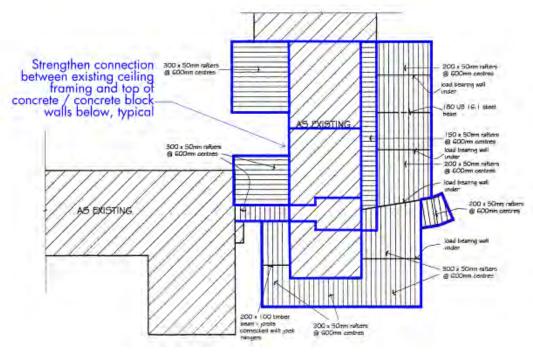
South Wing – Roof Plan -Strengthening Recommended
